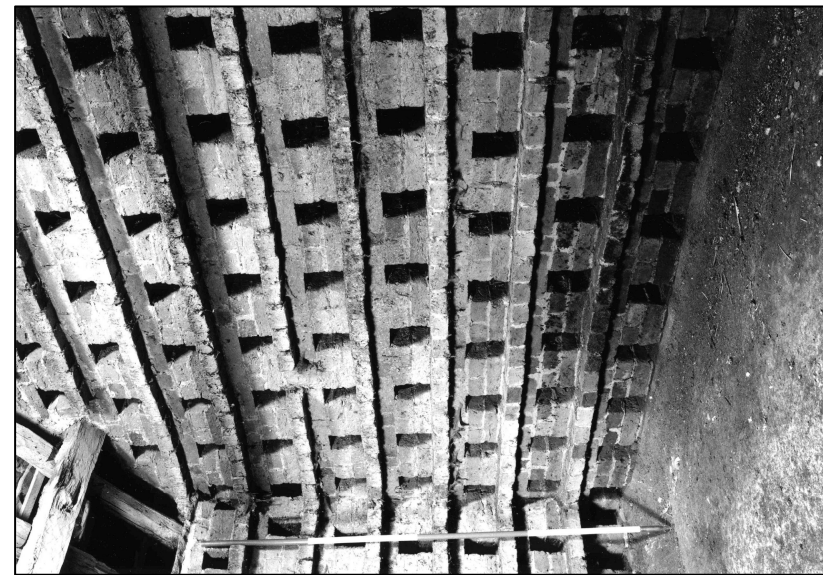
Granary: 2F pigeon loft, looking N (photo 4/4) (top to left).
